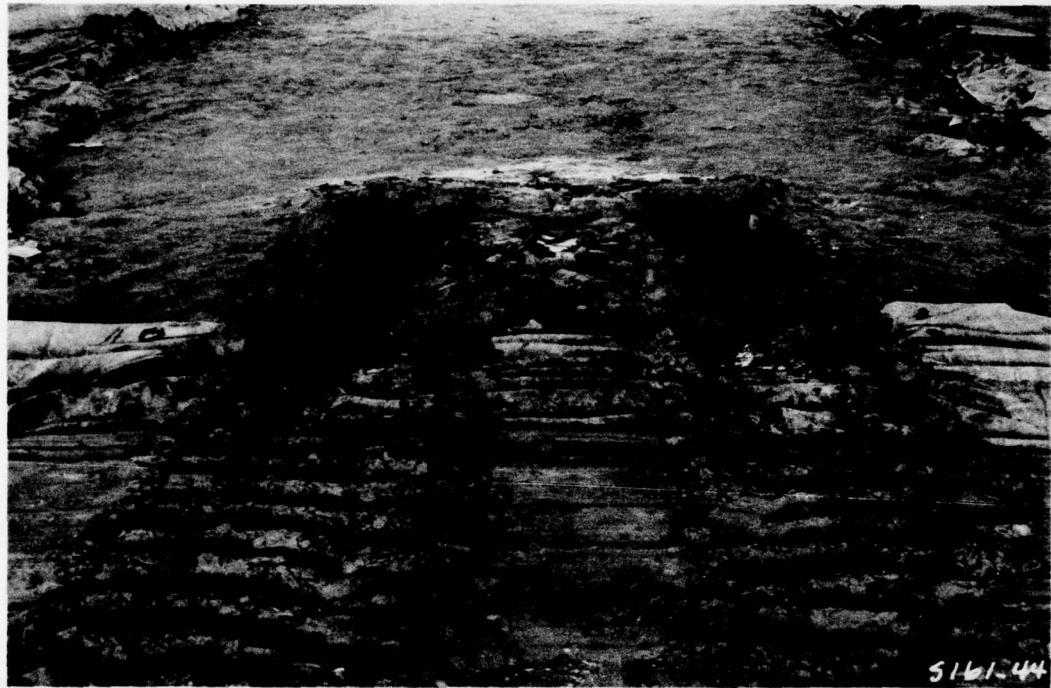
Closeup showing rutting and damaged grid from D-4 tractor
